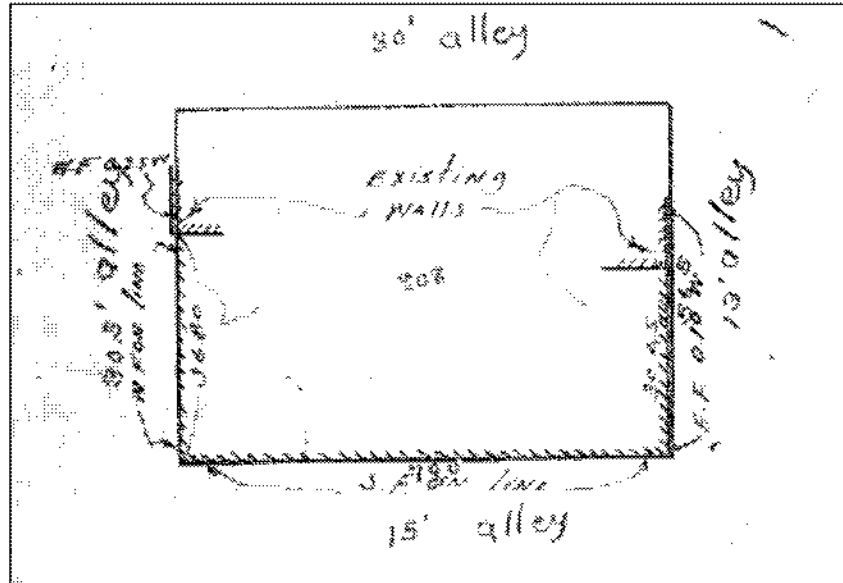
Detail, plat of existing building in Lot 808. Permit to Build No. 129415, November 21, 1929, National Archives and Records Administration.
